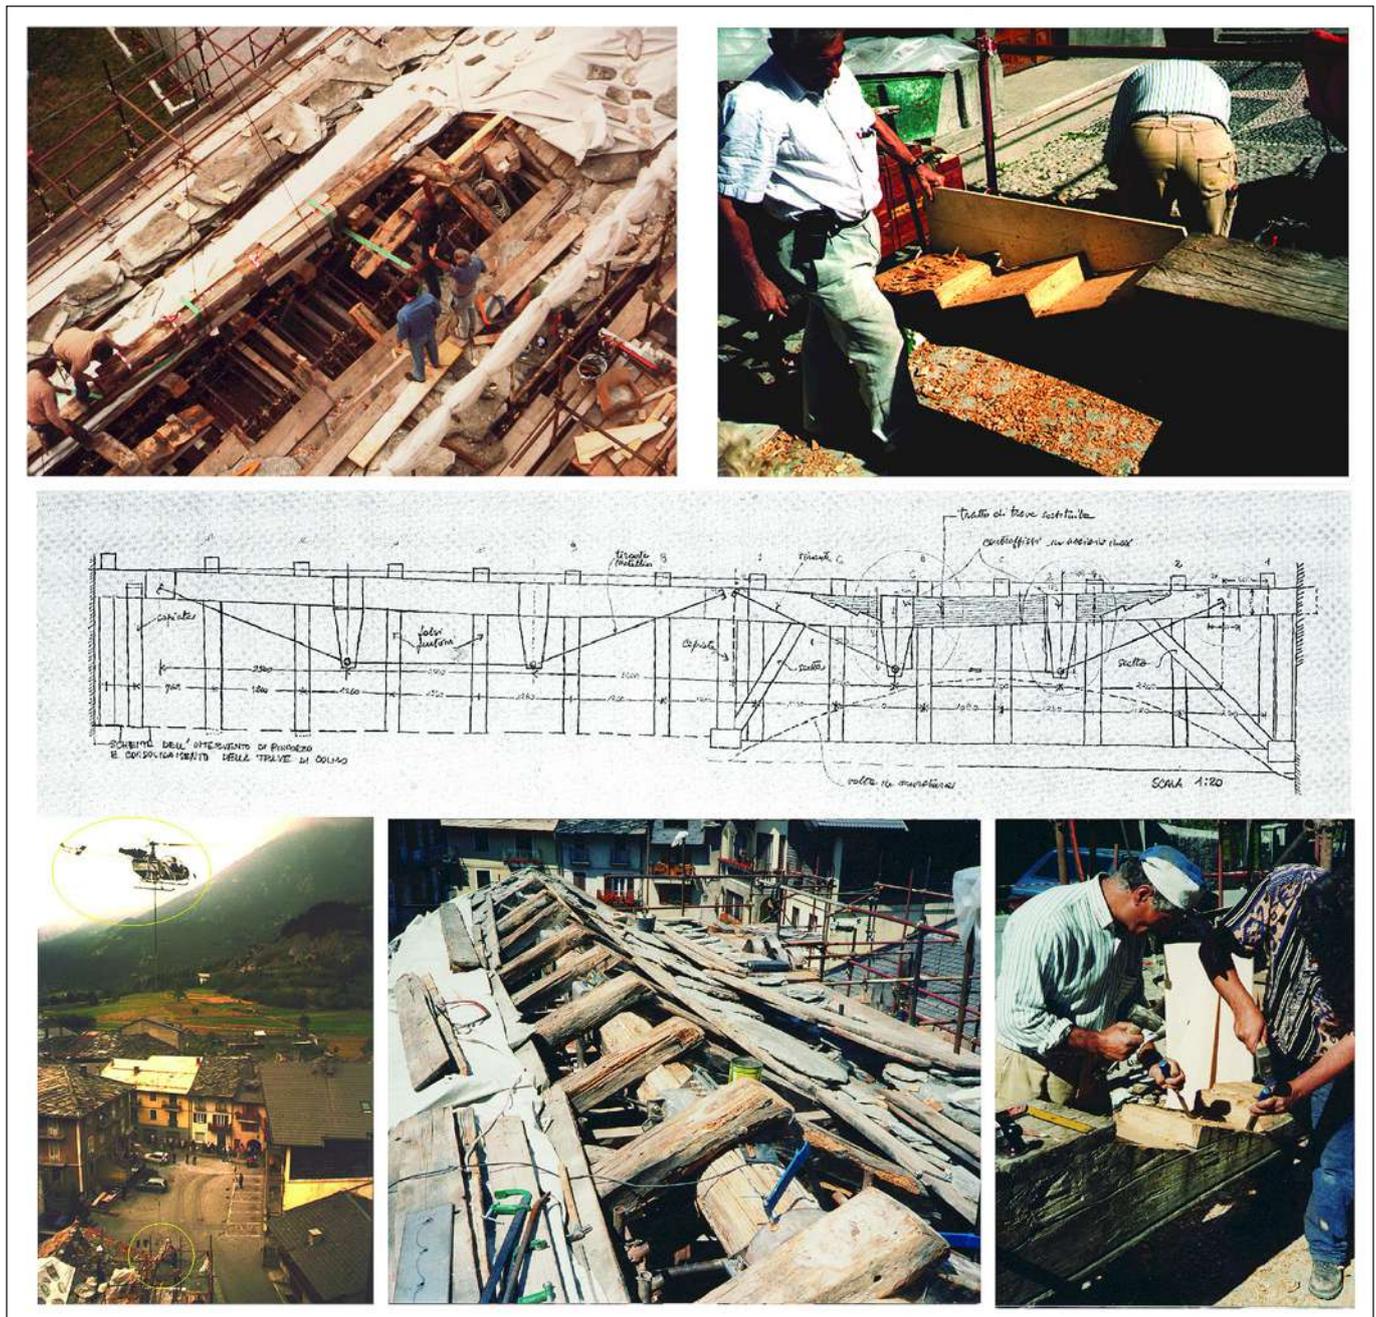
Phases of the interventions carried out in 2000 with the integration of timber elements, the realization of the double "dart of Jupiter" joint, the transportation of the larch beam on the construction site, some details of the steel elements of the reinforced beam, and the scheme of the reinforcement intervention with Polonceau system. (Image source: drawings and photos courtesy of C. Bertolini-Cestari).
